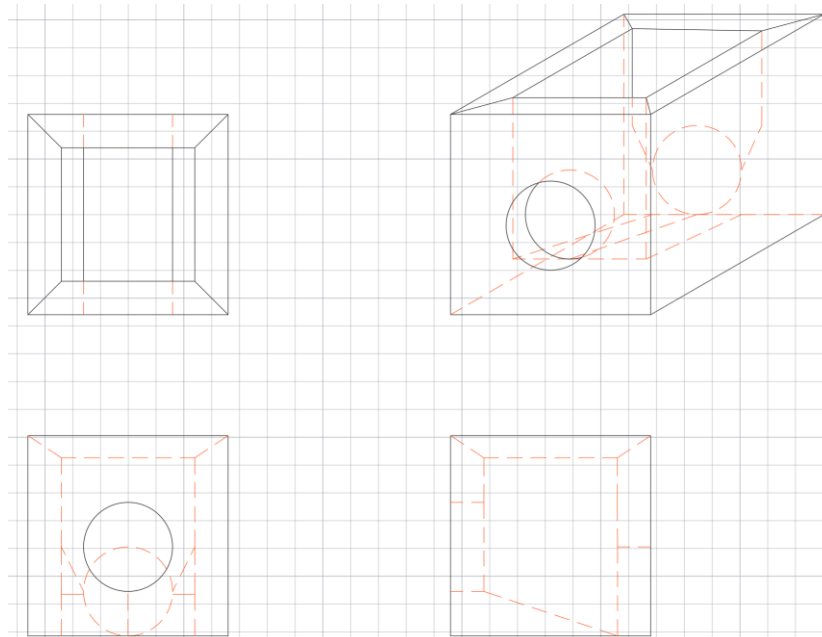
Proposed riser structure designed by Engineered Ecosystems.
